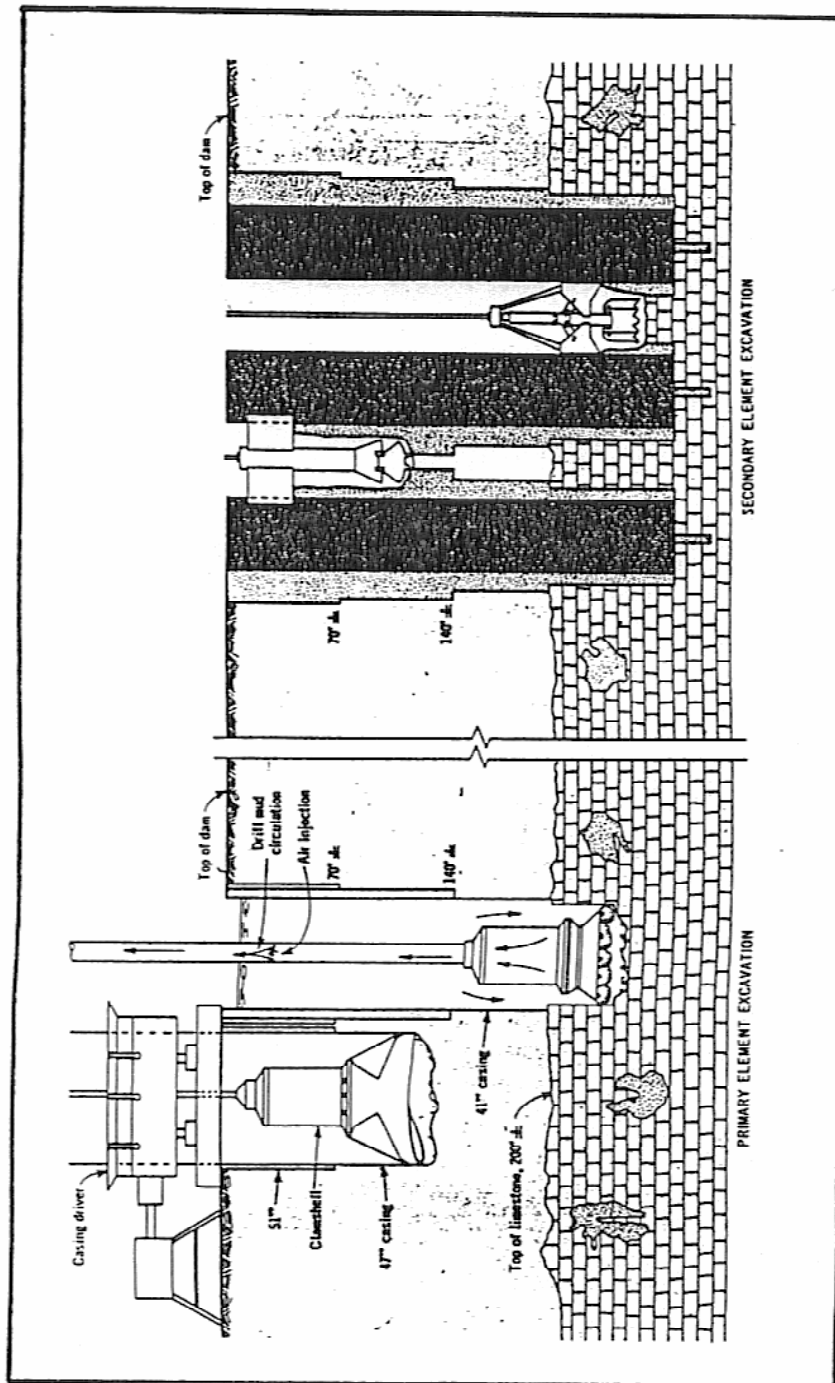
Cut-off wall construction details, Wolf Creek (6).
